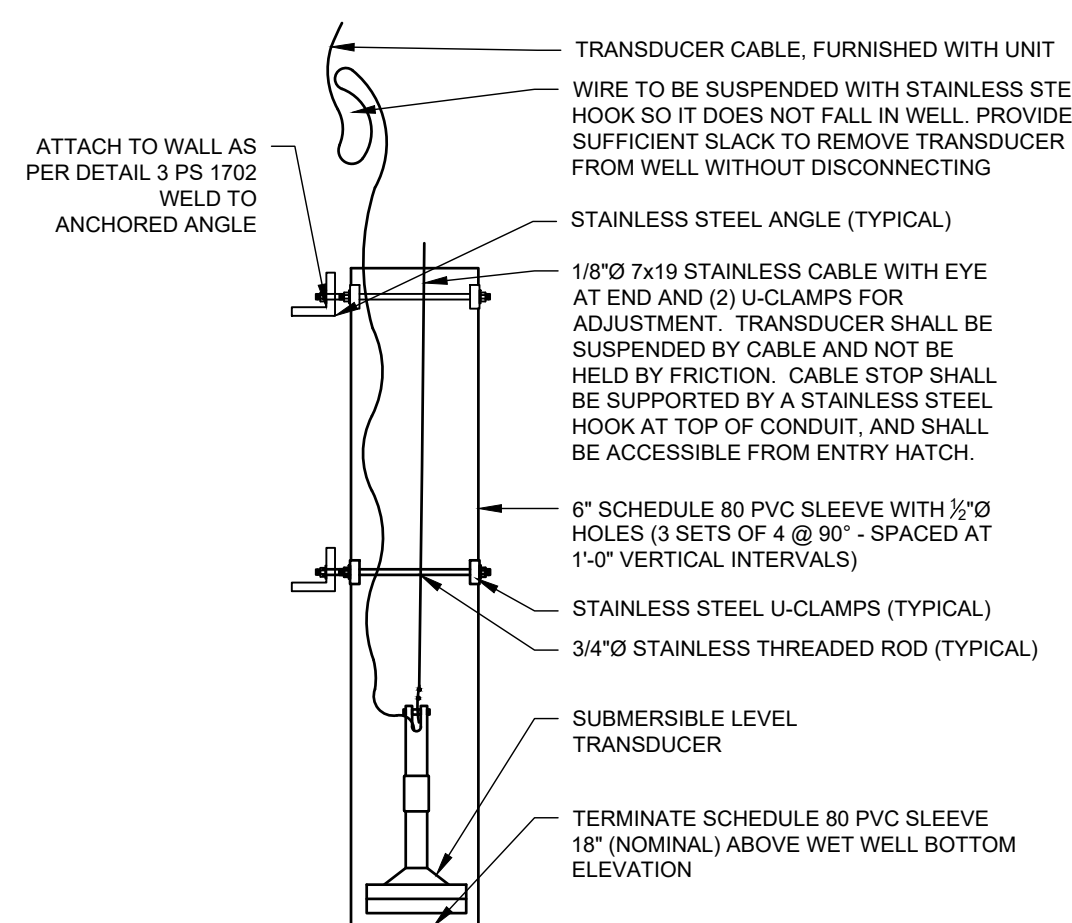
DETAIL- BRACKET AND PIPE SUPPORT DETAIL
